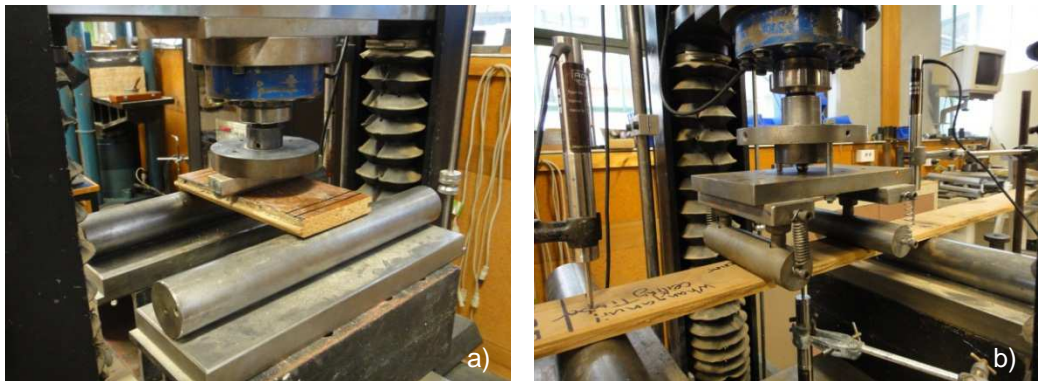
Material testing: a) Floor boards; b) Ceiling boards
